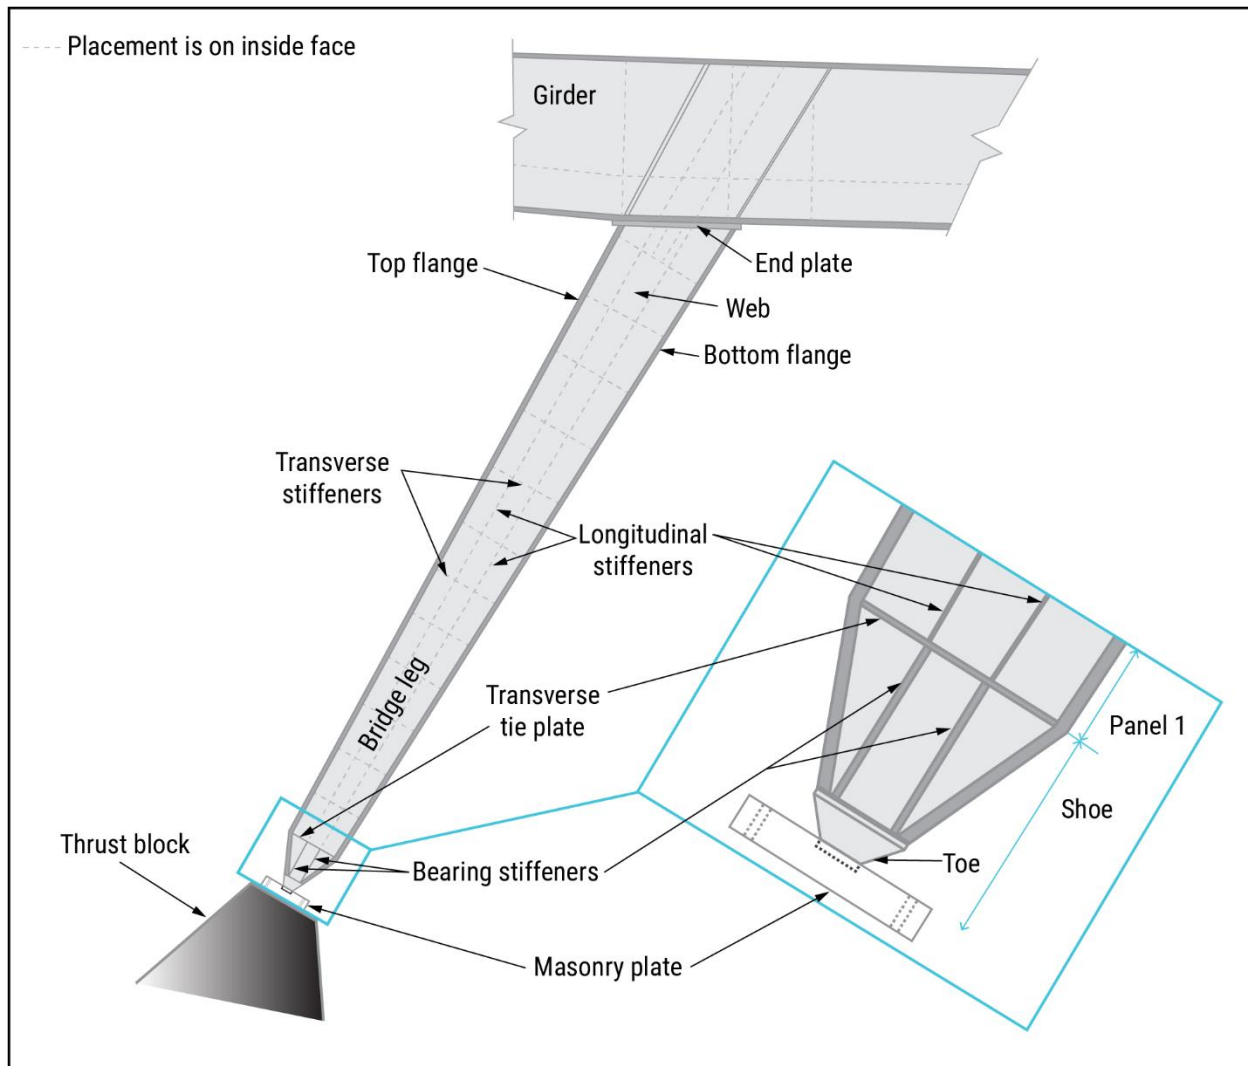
Inward-looking elevation view of a Fern Hollow Bridge leg and section of girder.
